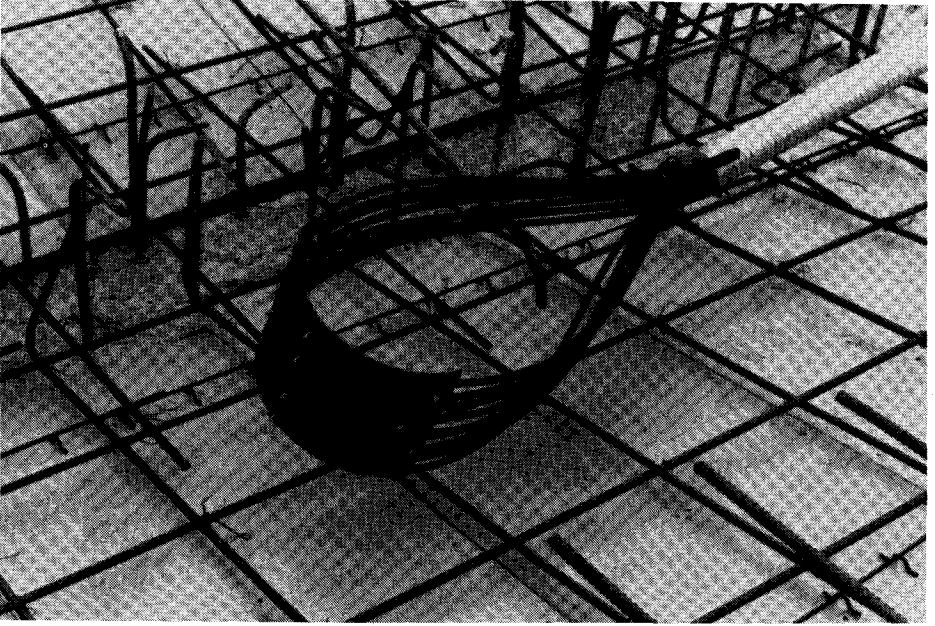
Multiple strand tendon loop anchorage used in the Kline Avenue Bridge, Indiana, and Houston Ship Channel Bridge, Texas.
